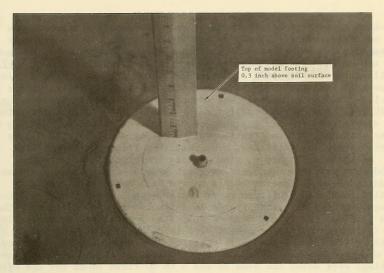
Six-inch non-preconsolidated footing after settlement due to footing load.
